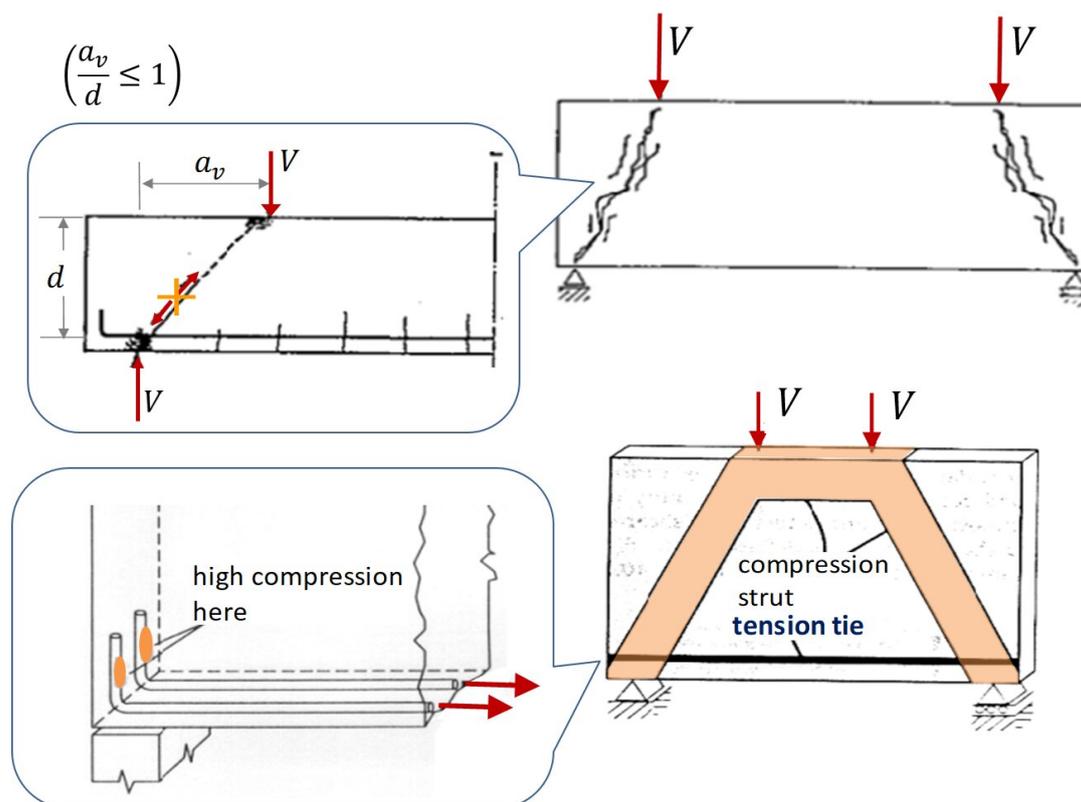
Category I (Deep Beams)  $a_v/d < 1$ : Diagonal splitting, arch action. Bottom: anchorage failure of deep beam failure.
